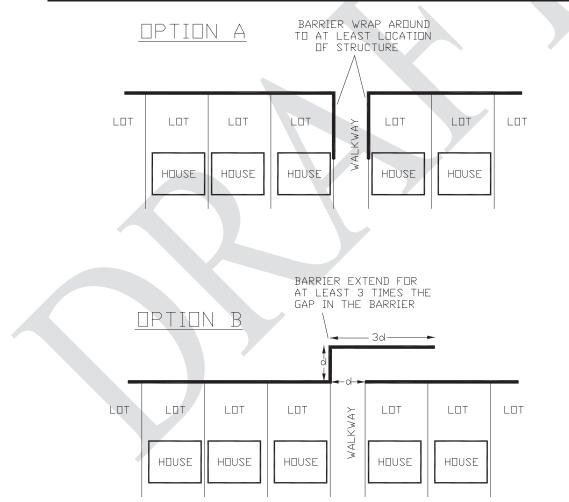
Minimum Recommended Walkway/Roadway Penetration Barrier Construction
